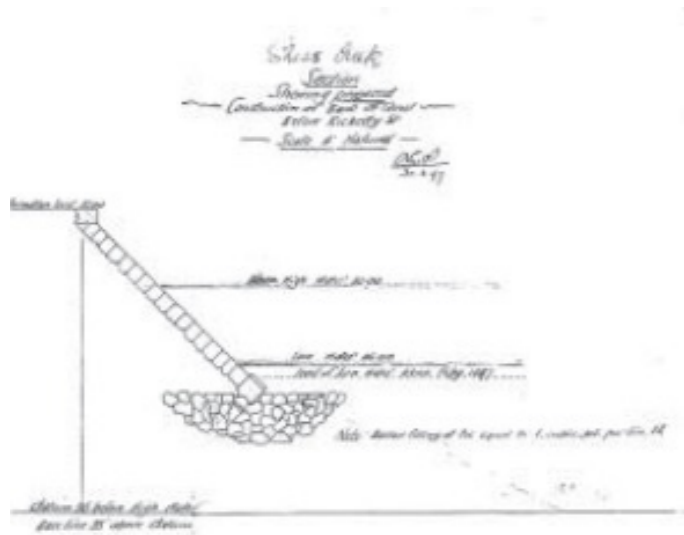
Early construction of the Canal (below Ricketty Street) included sandstone walling with stone ballast as the footing. Source: DPWS Plan Room Drg 32440.
